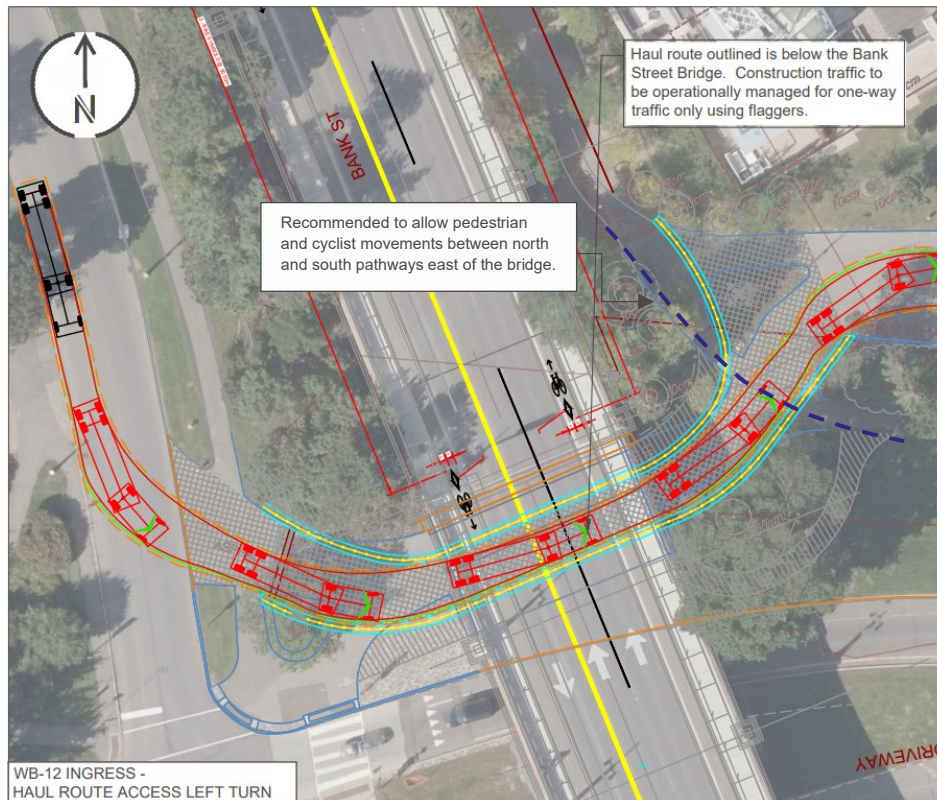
Lansdowne 2.0 Temporary Construction Haul Route Access
